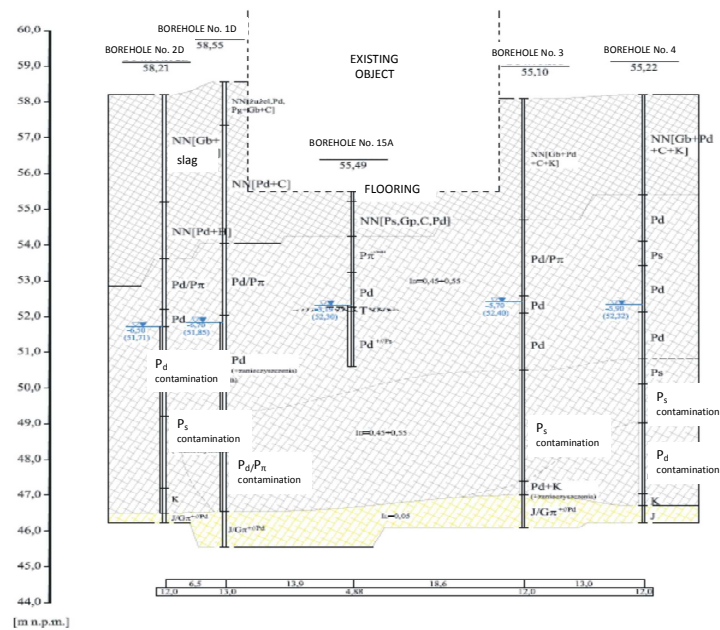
Geotechnical cross-section under the existing Dressing Room and Bath (Szatnia-Łaźnia)
